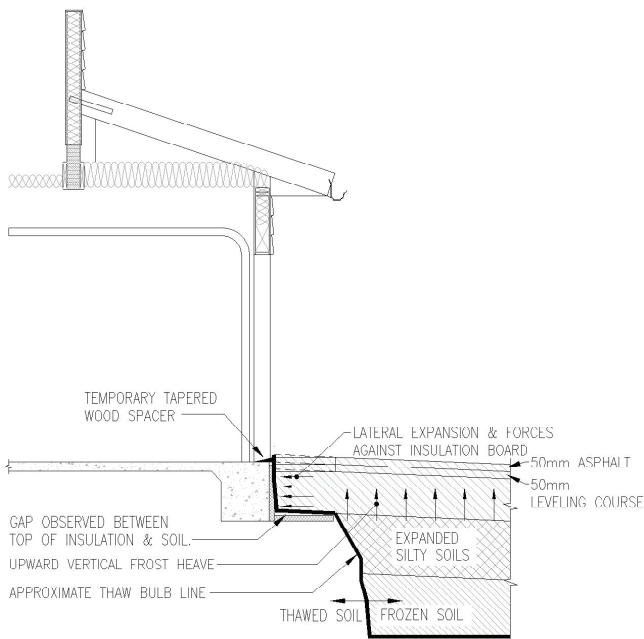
Interpreted ground heaving conditions and consequent expansion forces that caused vertical movement of pavement, stoops, patio slabs, and vertical insulation boards.
